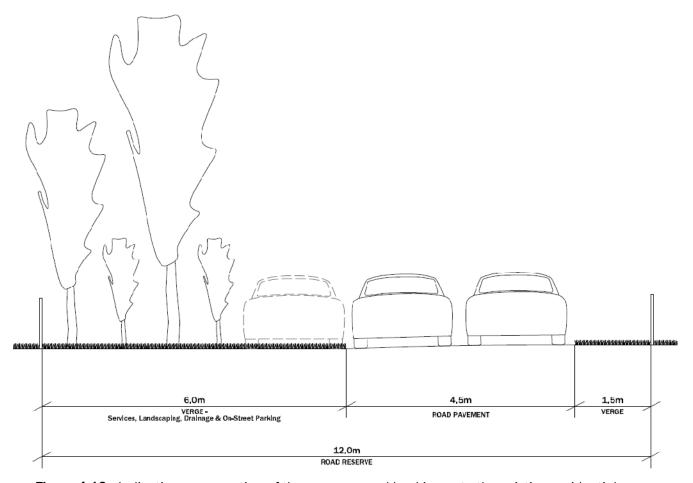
Indicative cross section of the one way road backing onto the existing residential area.
